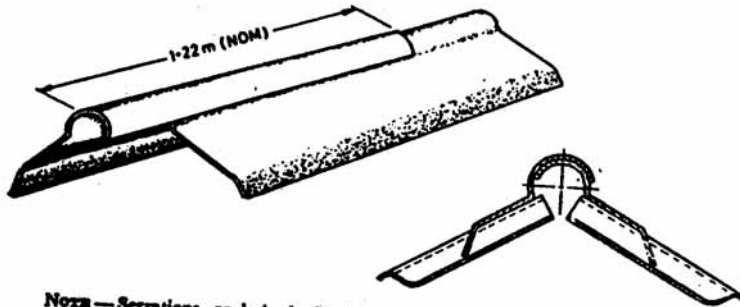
FIG. C TYPICAL CORNER FITTING ADJUSTABLE RIDGE.
